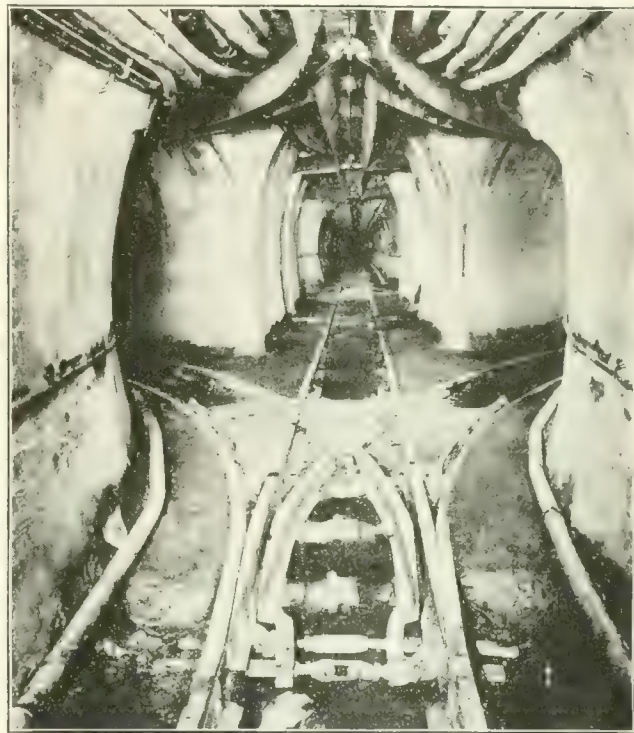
NARROW-GAGE TUNNEL HANDLING FREIGHT AND EXCAVATED MATERIAL AT CHICAGO
